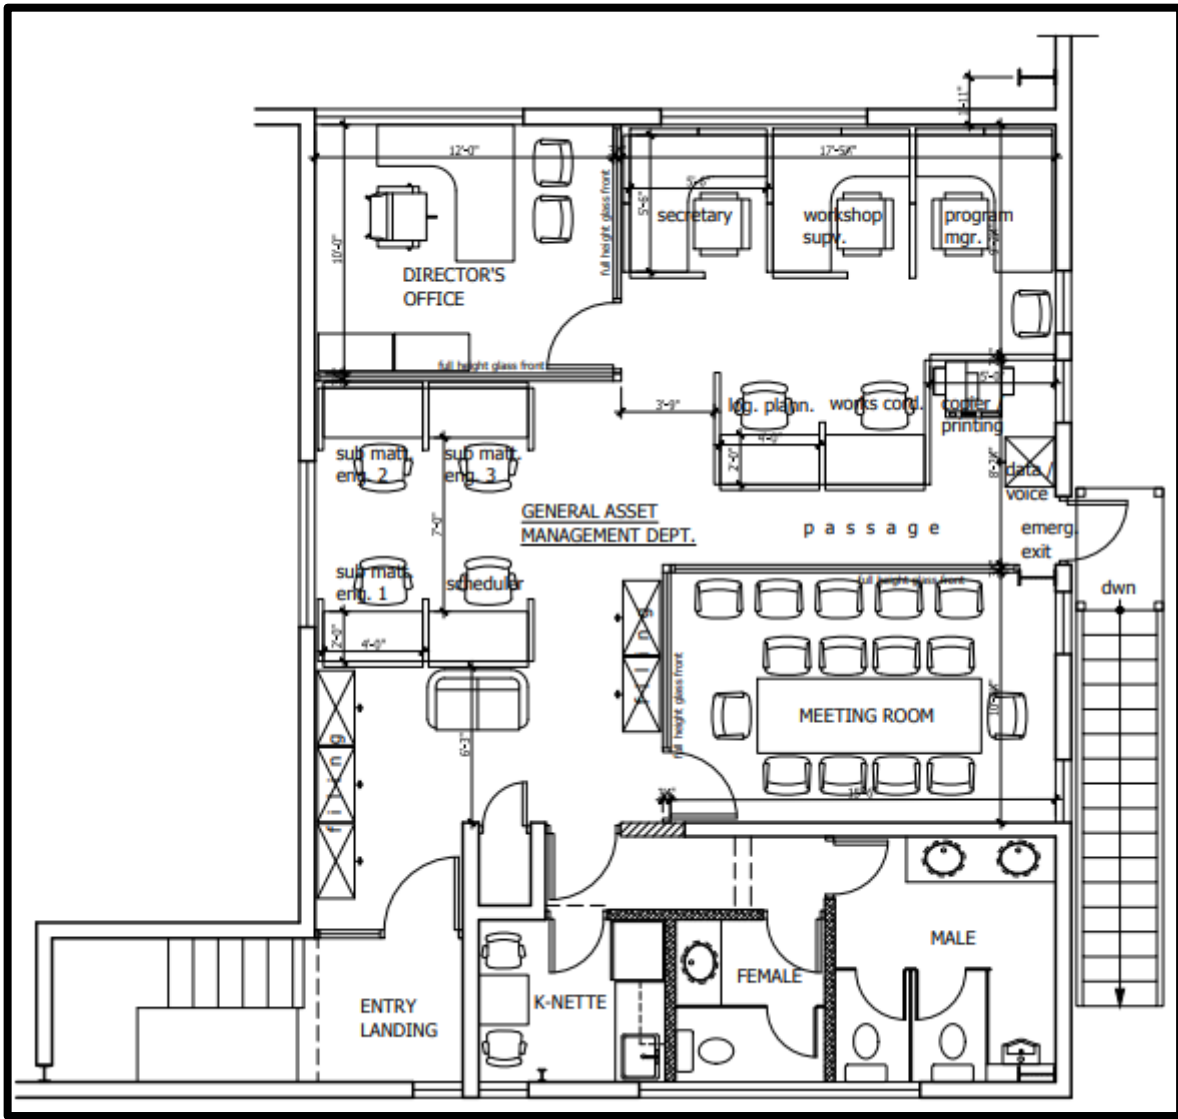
GAMG FLOOR PLAN (SOURCE: DESIGNED AND DRAWN BY MERVIN HILTON, PRODUCED BY AUTHOR)
